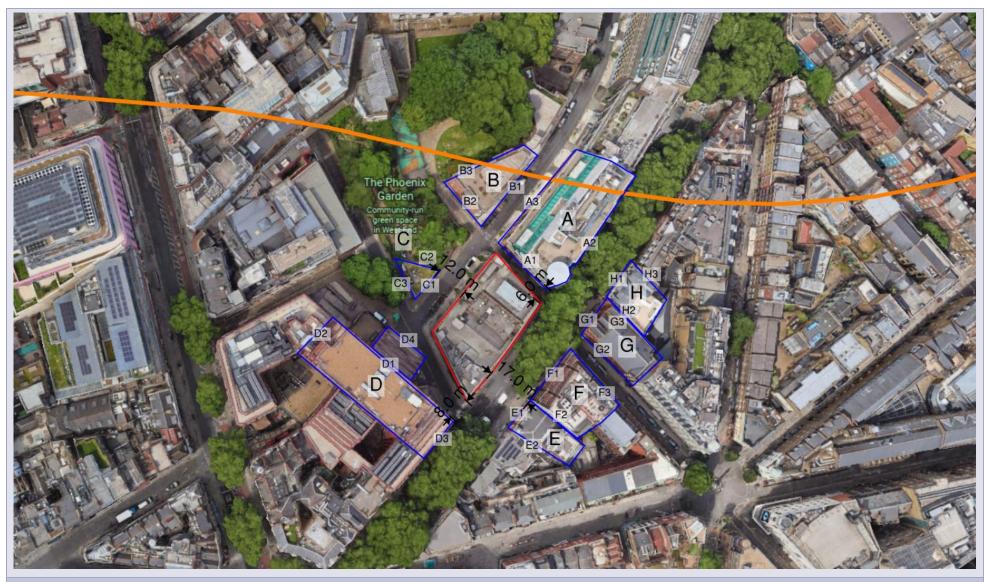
Plan of Adjacent Structures and Facades (Crossrail shown in Orange)
